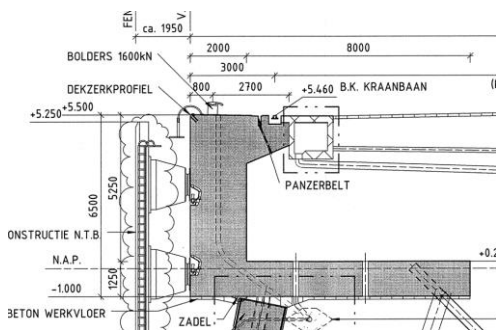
Existing quay wall. On top the cable tower will be mounted (source drawing= [1]).
